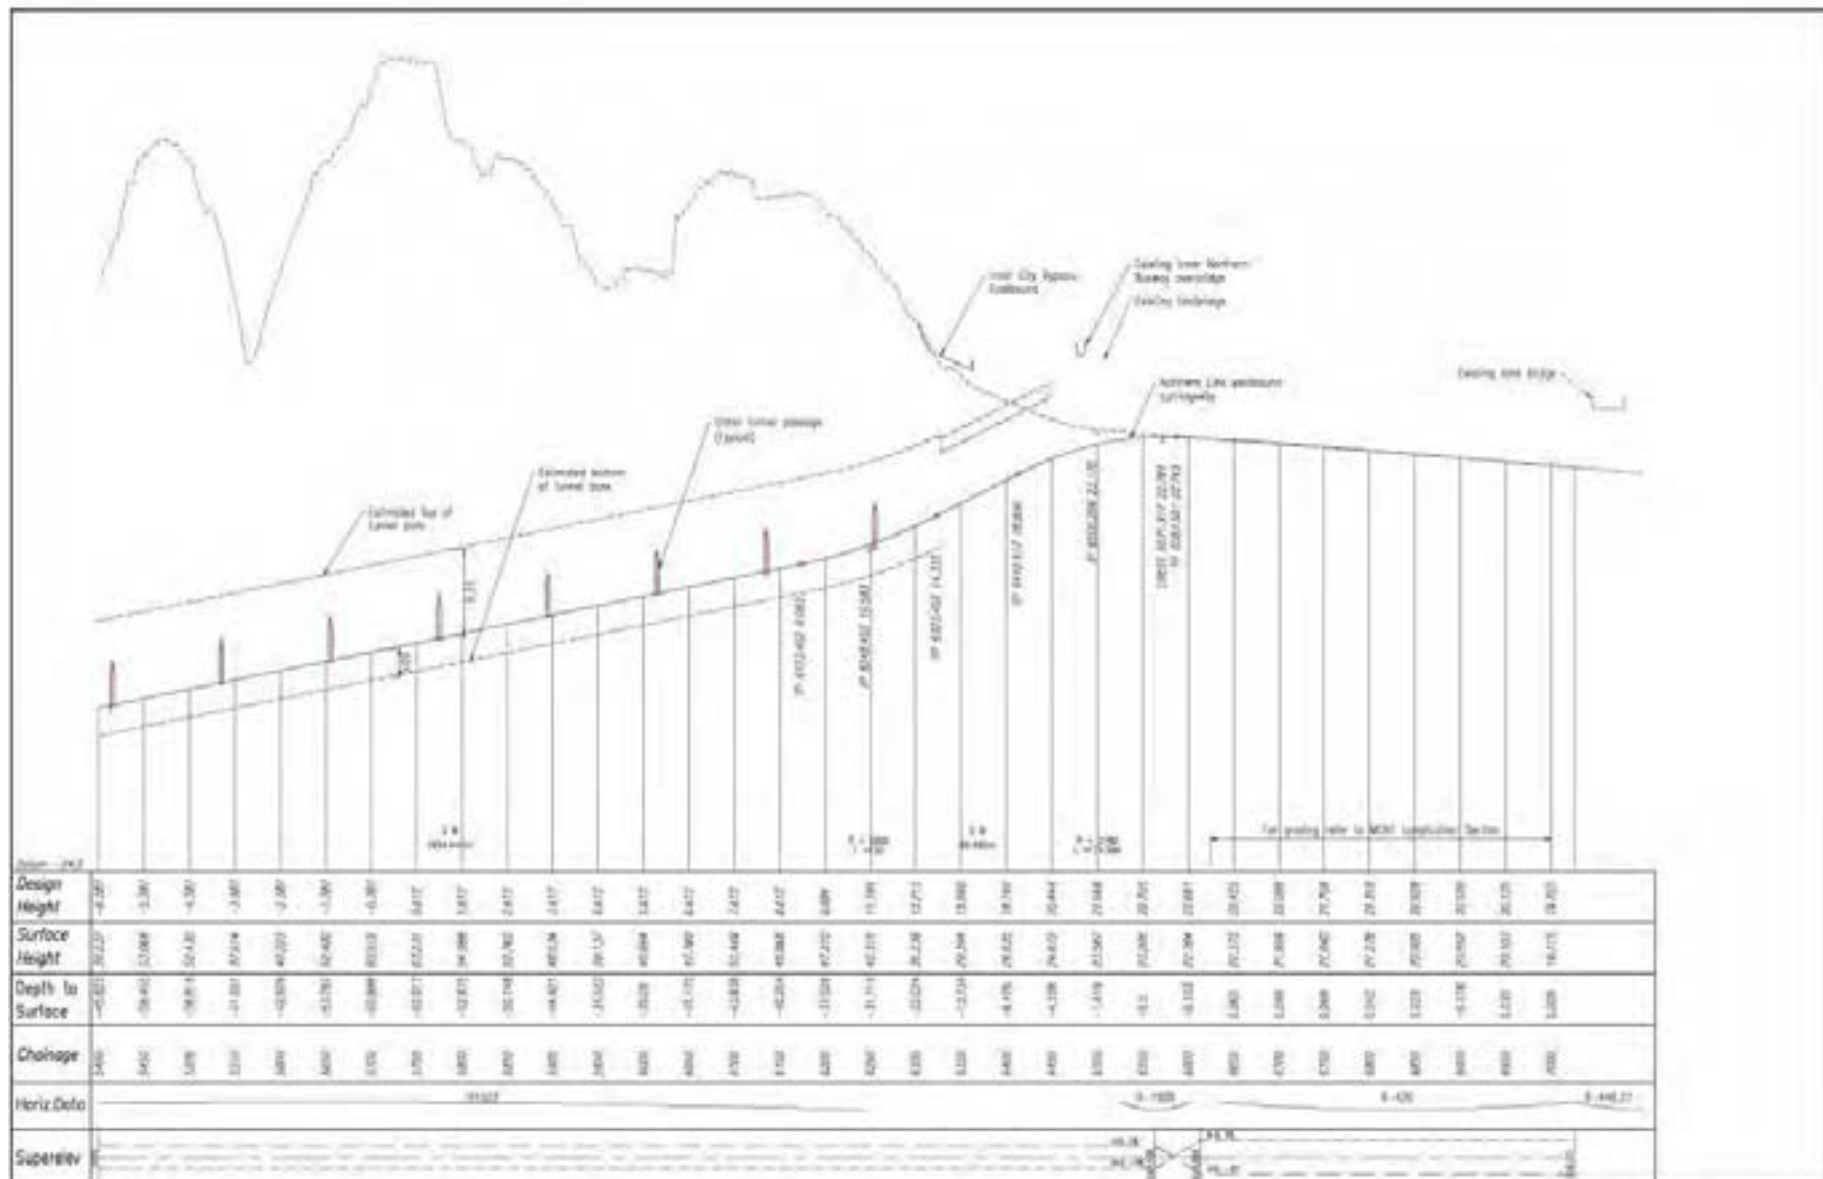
Westbound tunnel vertical alignment –ICB Connection
